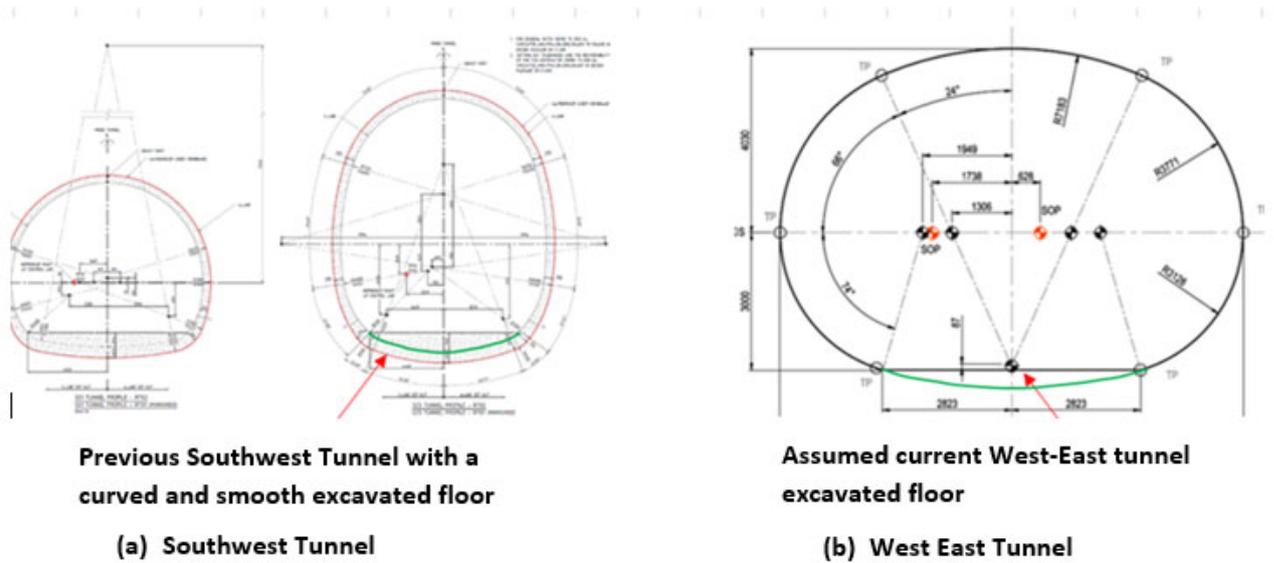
Assumed cross-section of Sydney Metro West tunnel
